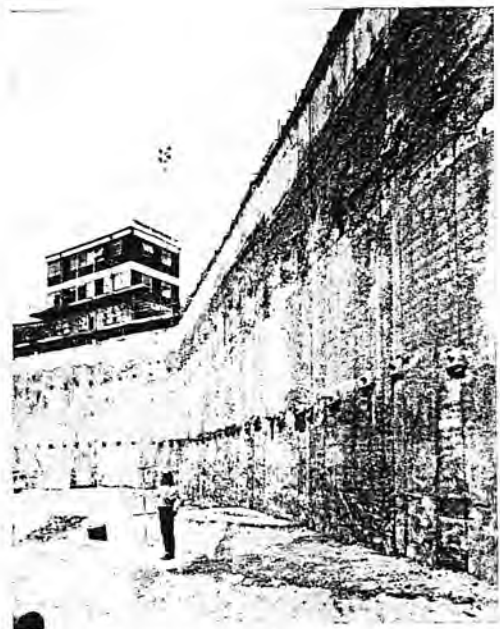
General view of anchored diaphragm wall—Vauxhall
